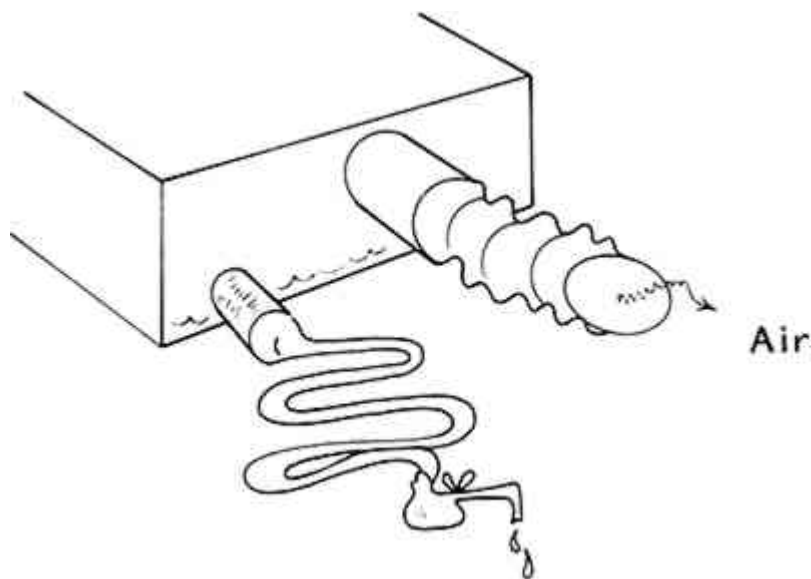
Plenum space used as a water trap and fitted with a drain.
